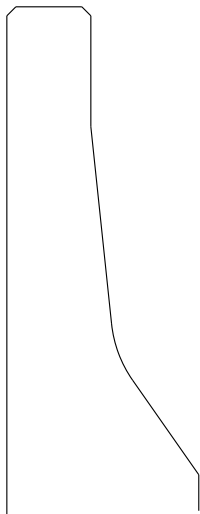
Ex Barrier Sec 42 NJ Cell (Barriers and Rails Library)
